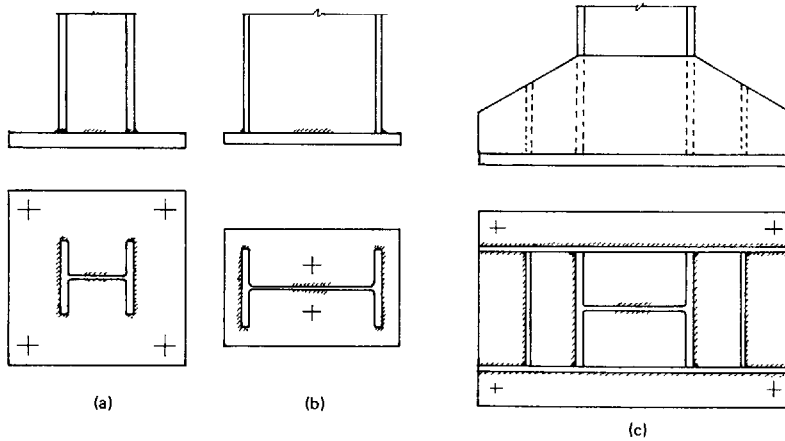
Column bases for UB and UC column sections. (a) and (b) Unstiffened slab bases; (c) stiffened base
